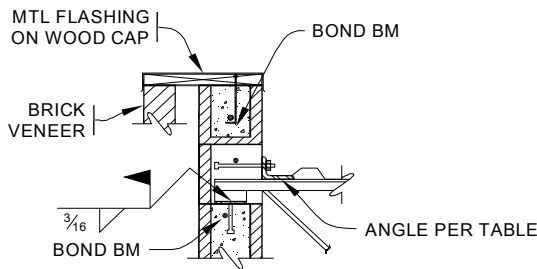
Joist bearing detail at roof of school building (Bond BM is for bond beam, MTL is for metal).
